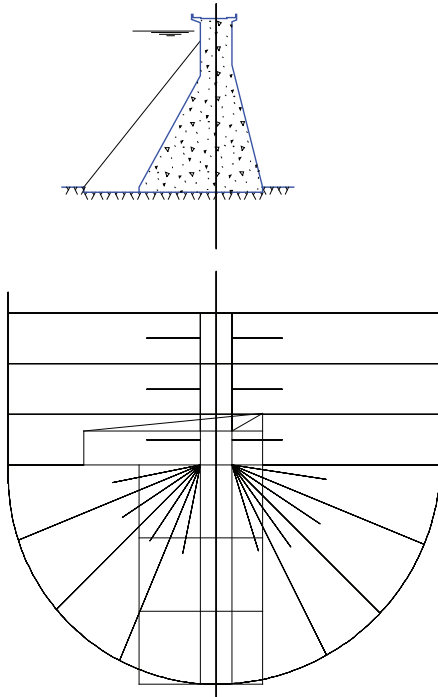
Typical cross-section of a transition wall
